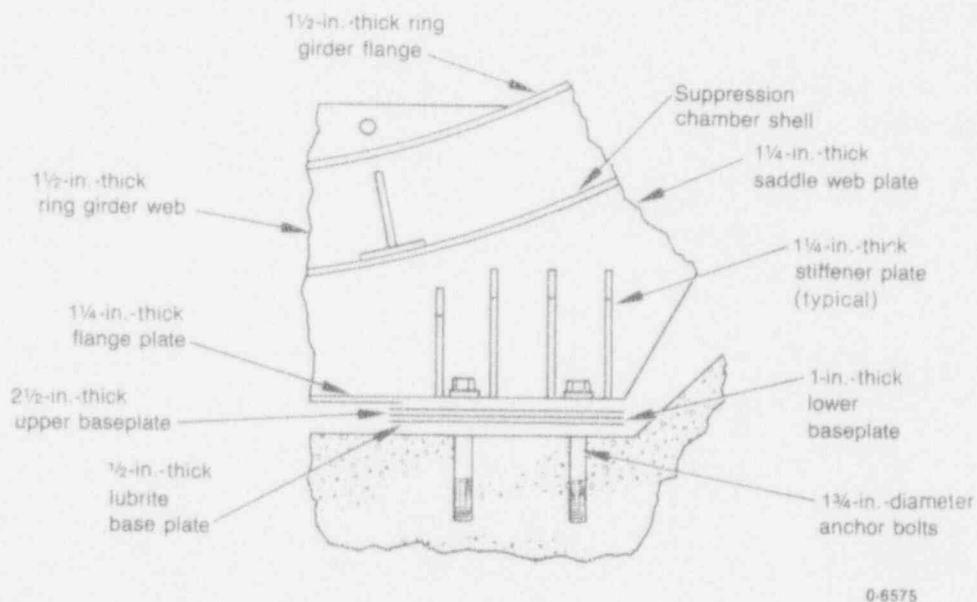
Elevation view of a typical suppression chamber saddle support, showing lubrite base plate.
